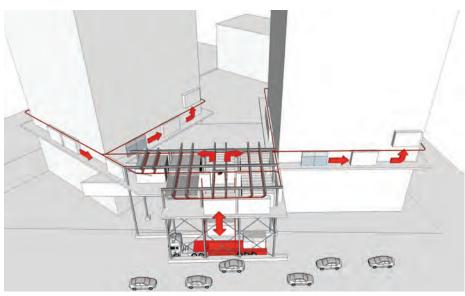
An example of a logistic plan at the building site (Source: Brunkeberg Systems) 图8. 施工地点物流规划范本(来源:Brunkeberg Systems)
